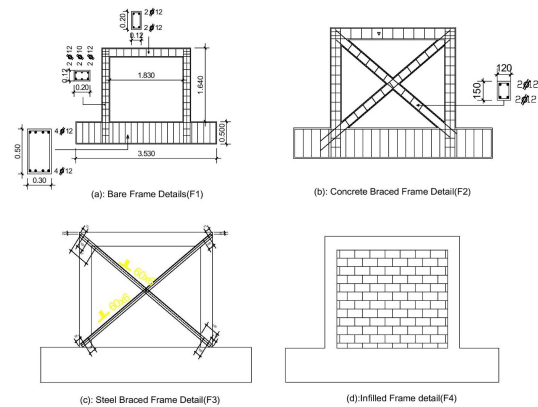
The specimen reinforcement and details (F1, F2, F3, and F4) [2]
